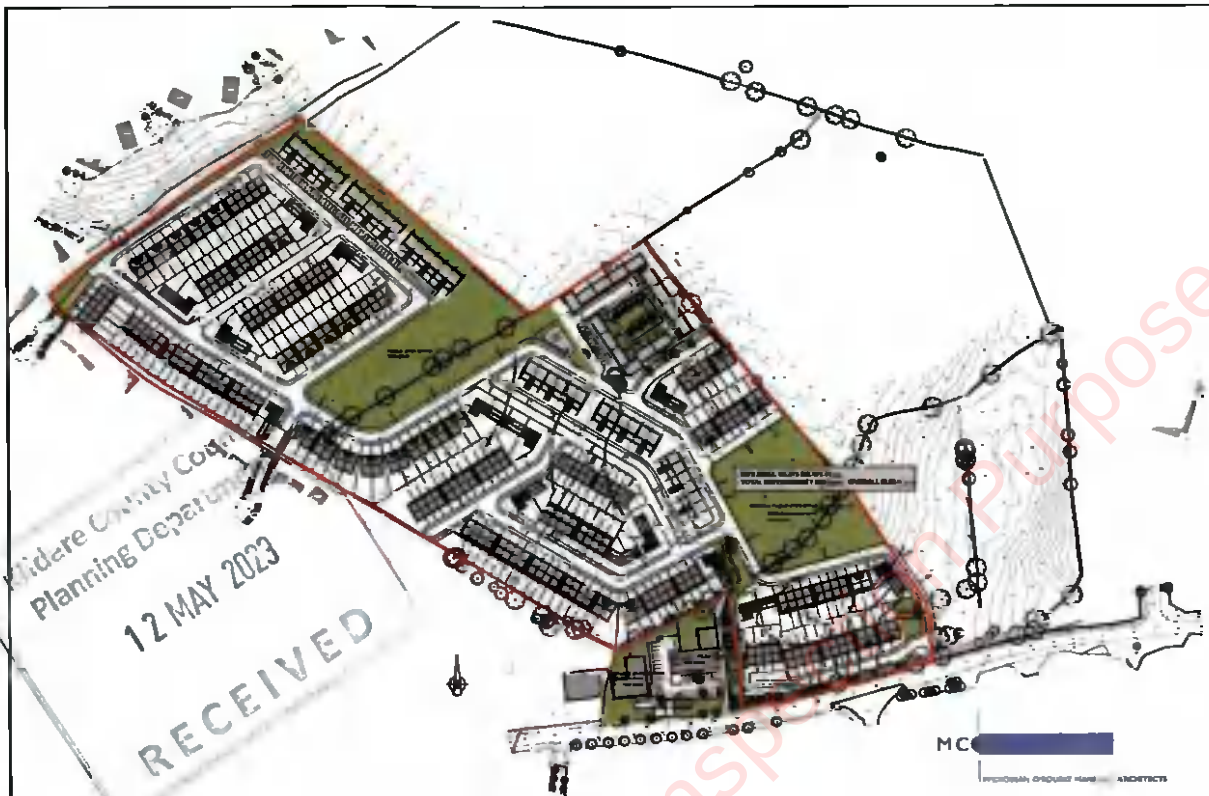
Alternative D Site Layout Plan relocating the creche (Source: MCORM Architect's)
